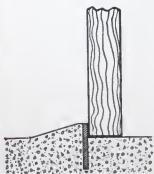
Concrete raised threshold with edge formed by flat steel bar set to concrete.
